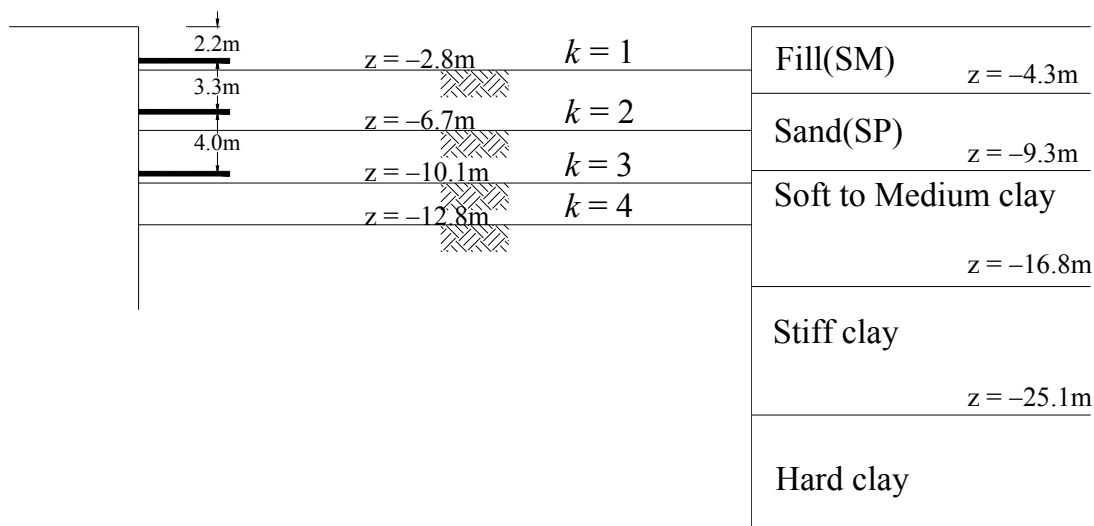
Soil stratigraphy and excavation stages at the Lurie Center site
